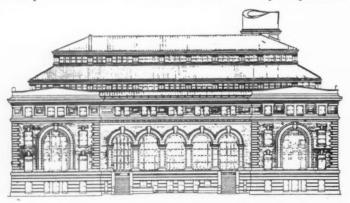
FRONT ELEVATION OF POWER HOUSE
